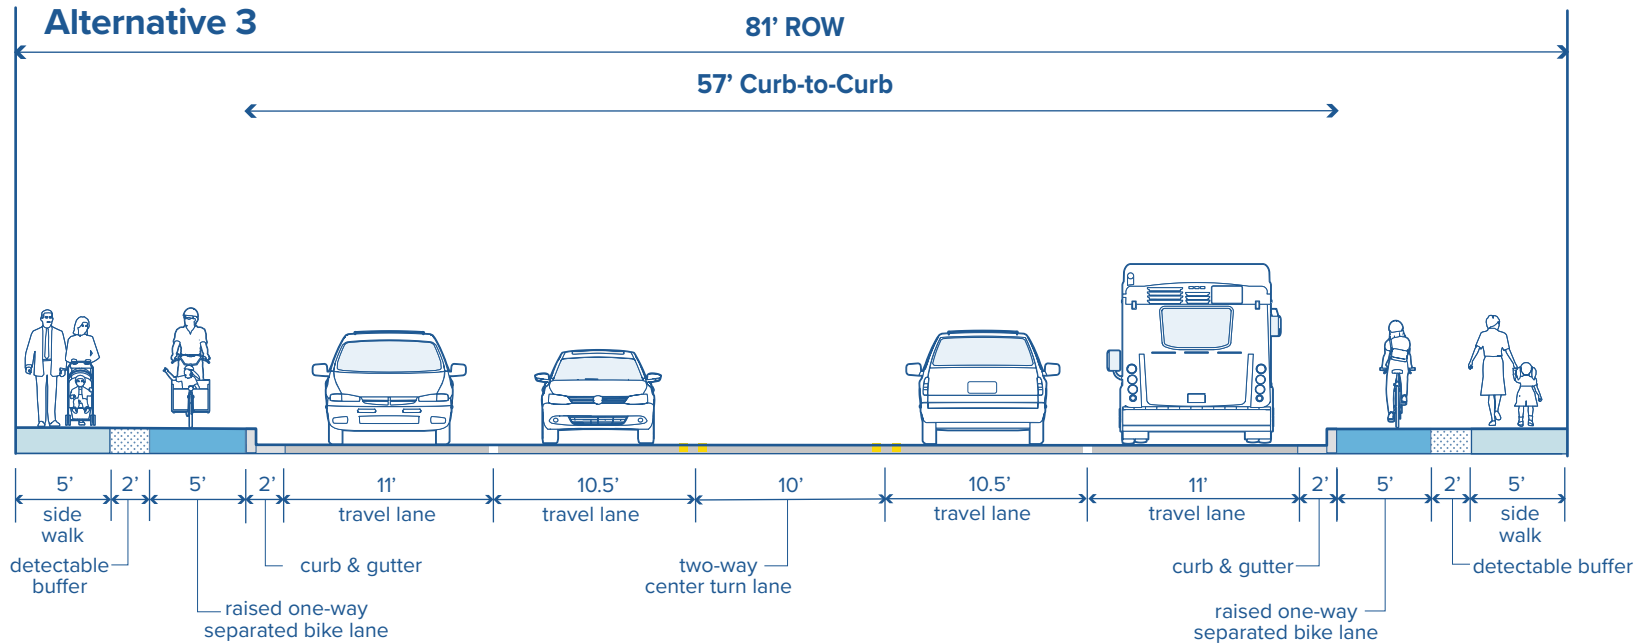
Alternative 3 Street-Level One-way Separated Bike Lanes
